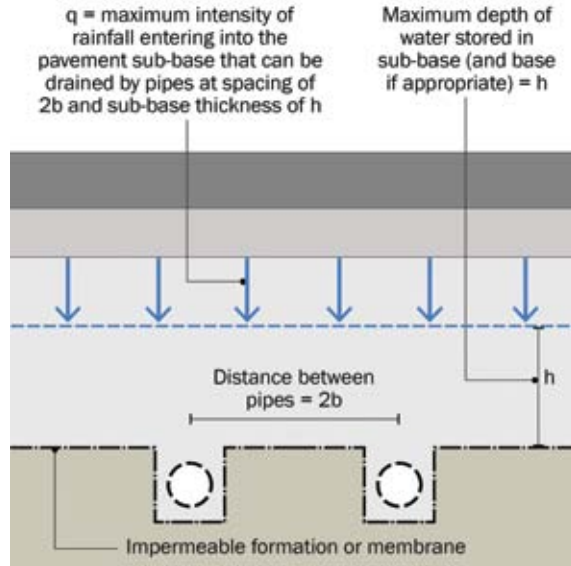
Outfall pipe spacing (after Interpave, 2010)
